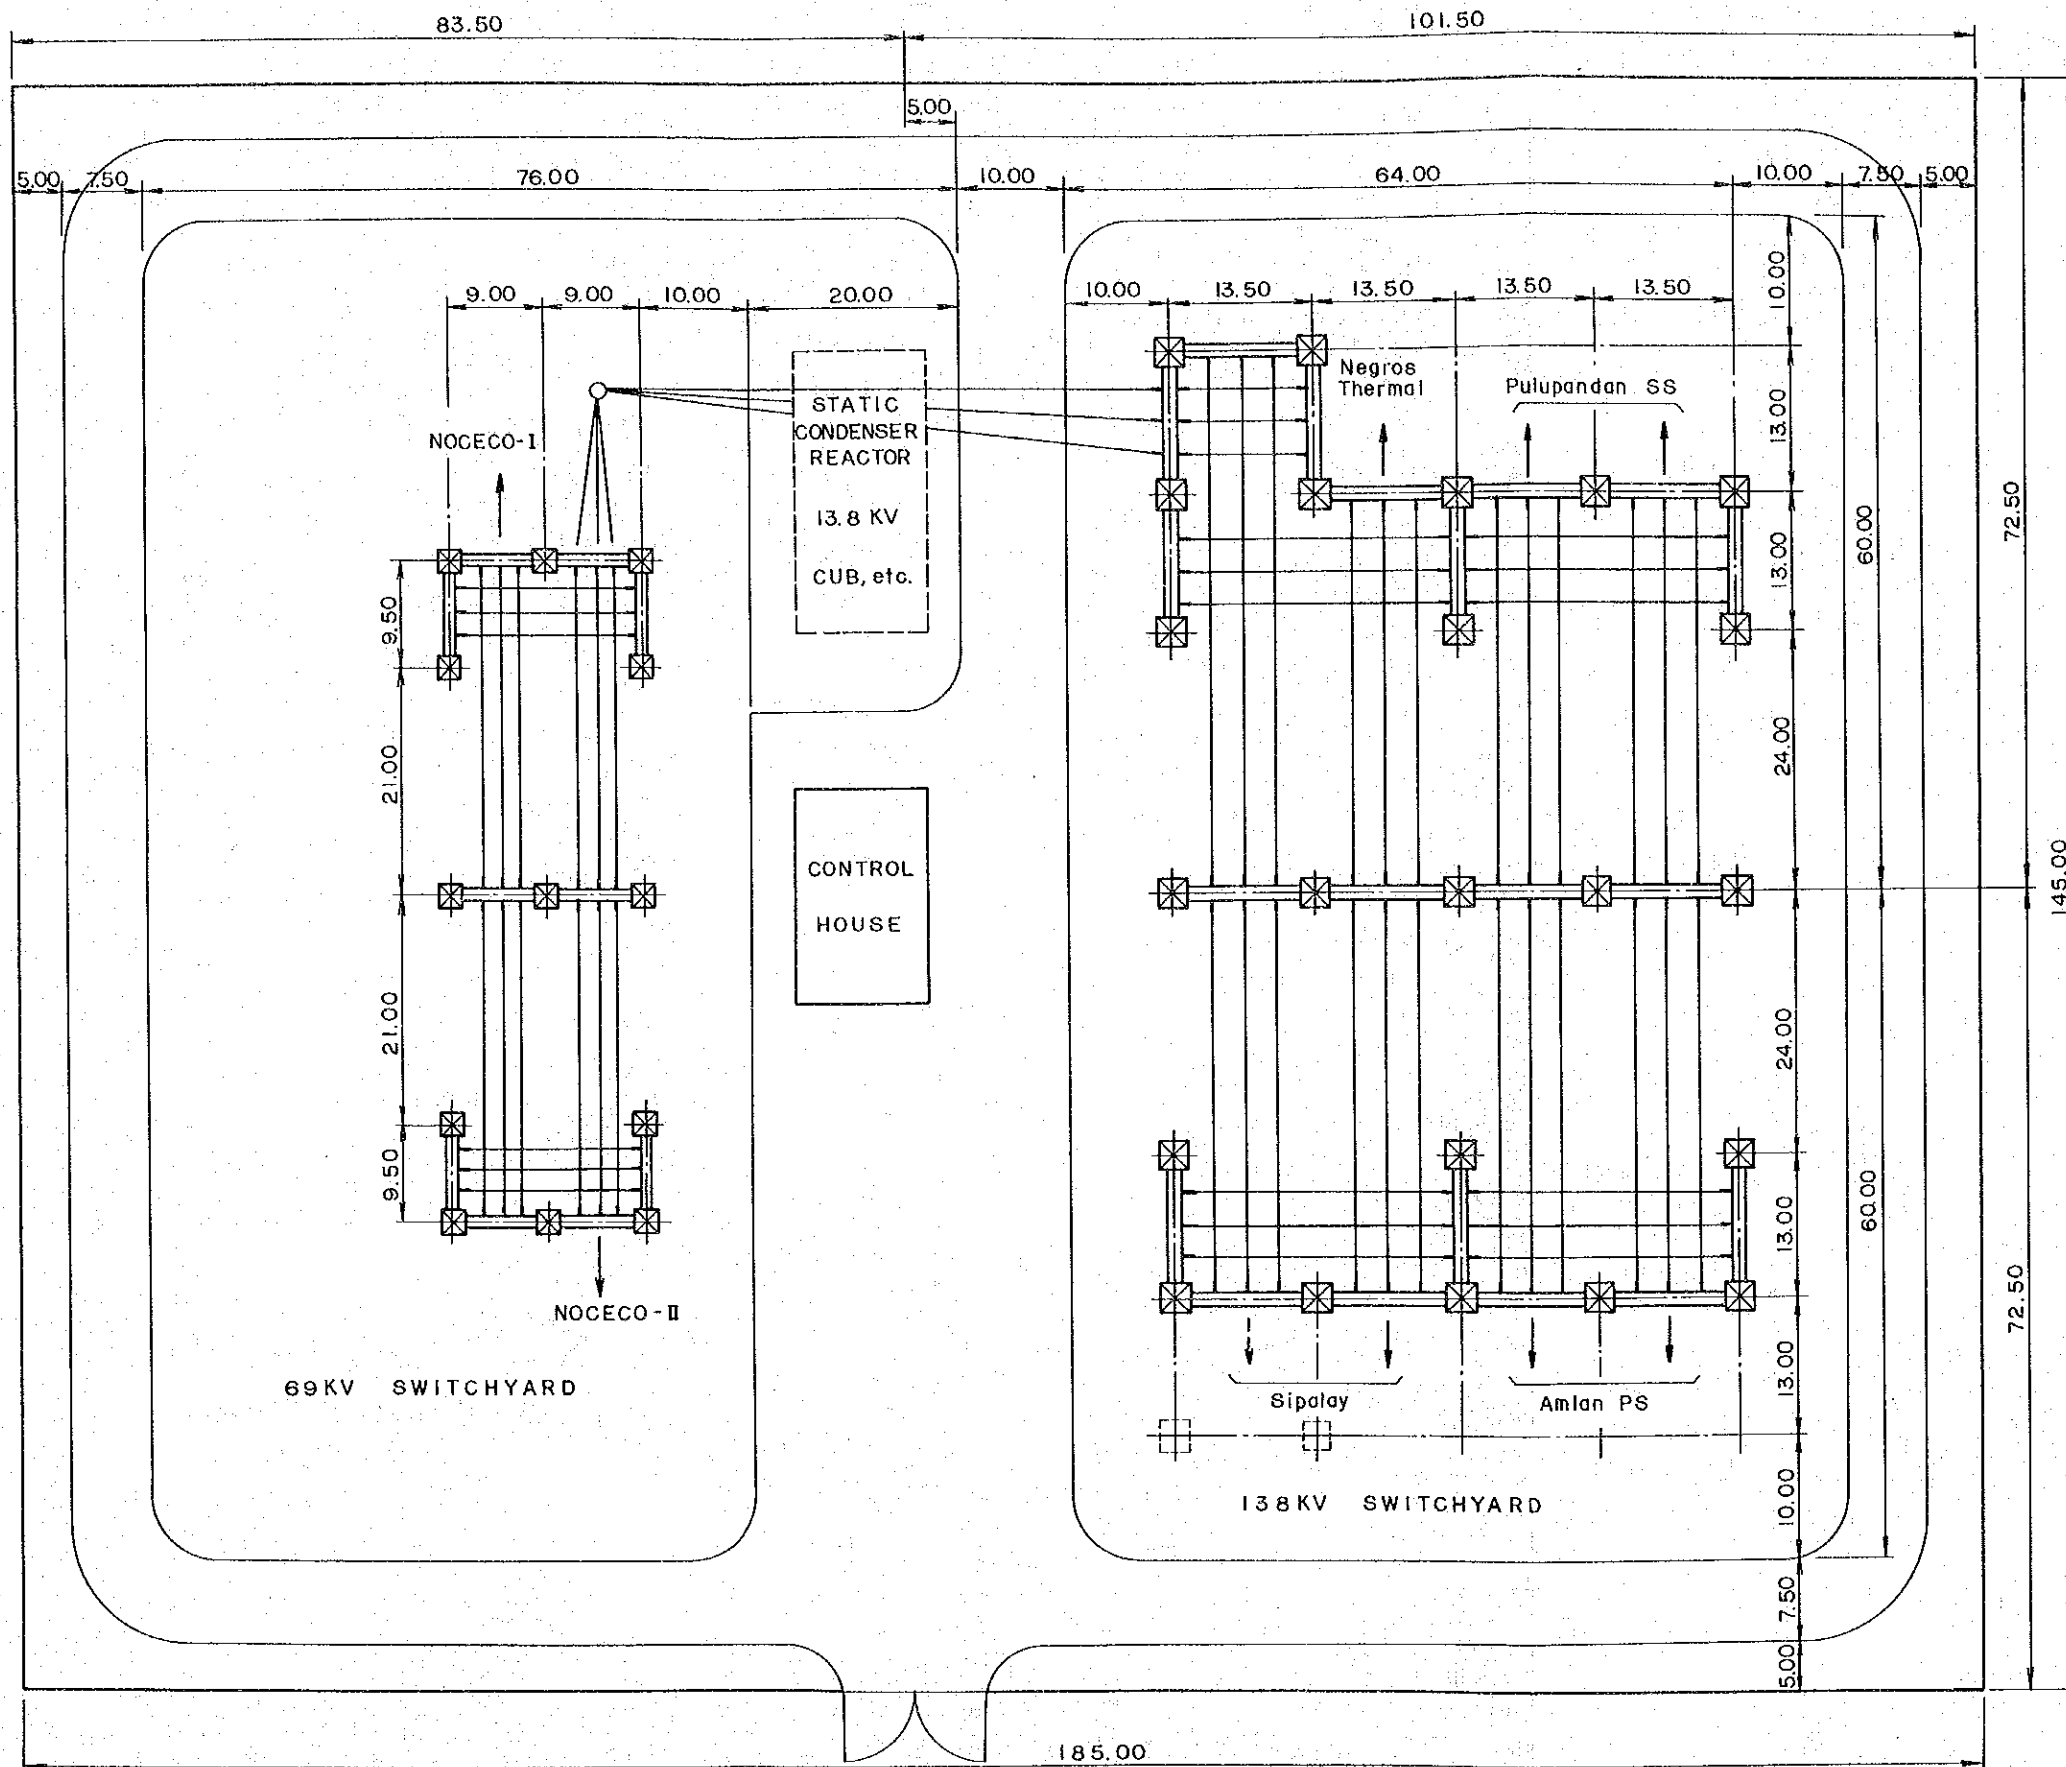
Pulupandan Substation Steel Structure Arrangement
